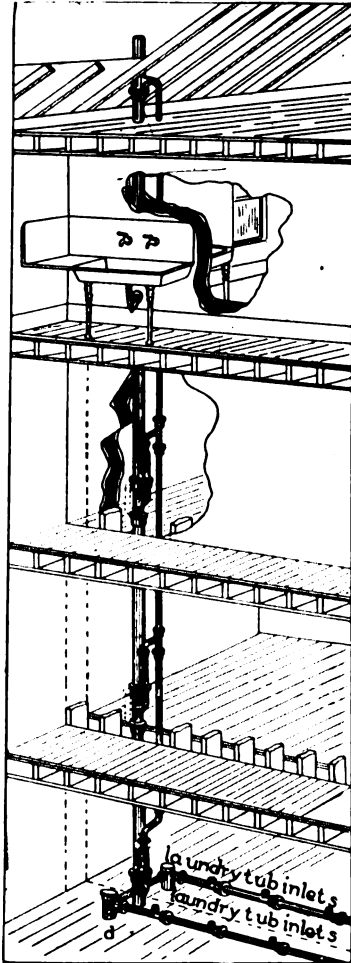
Broken General View of Waste and Vent Stacks for Laundries and Kitchen Sinks of a Flat Building.
